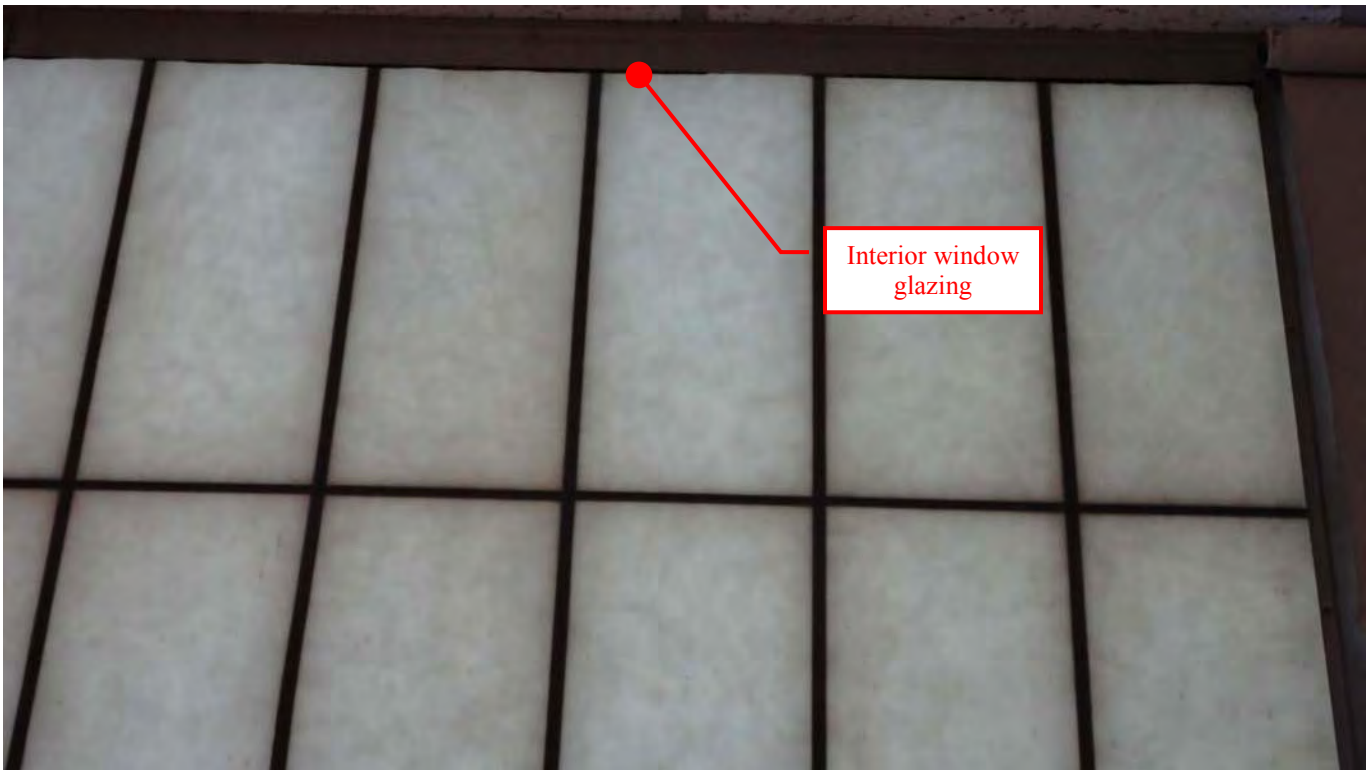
Typical hallway window frame caulk (horizontal and vertical joint) and window glazing (black).
